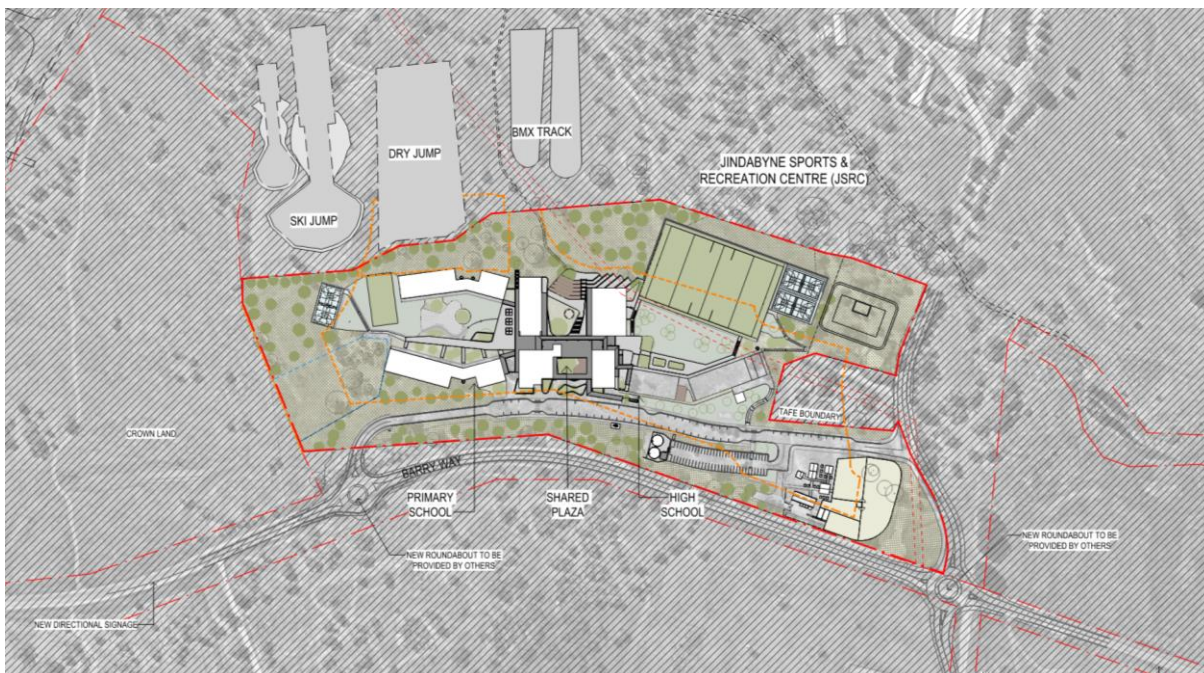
APPROVED SCHOOL SITE PLAN - SSD-15788005
